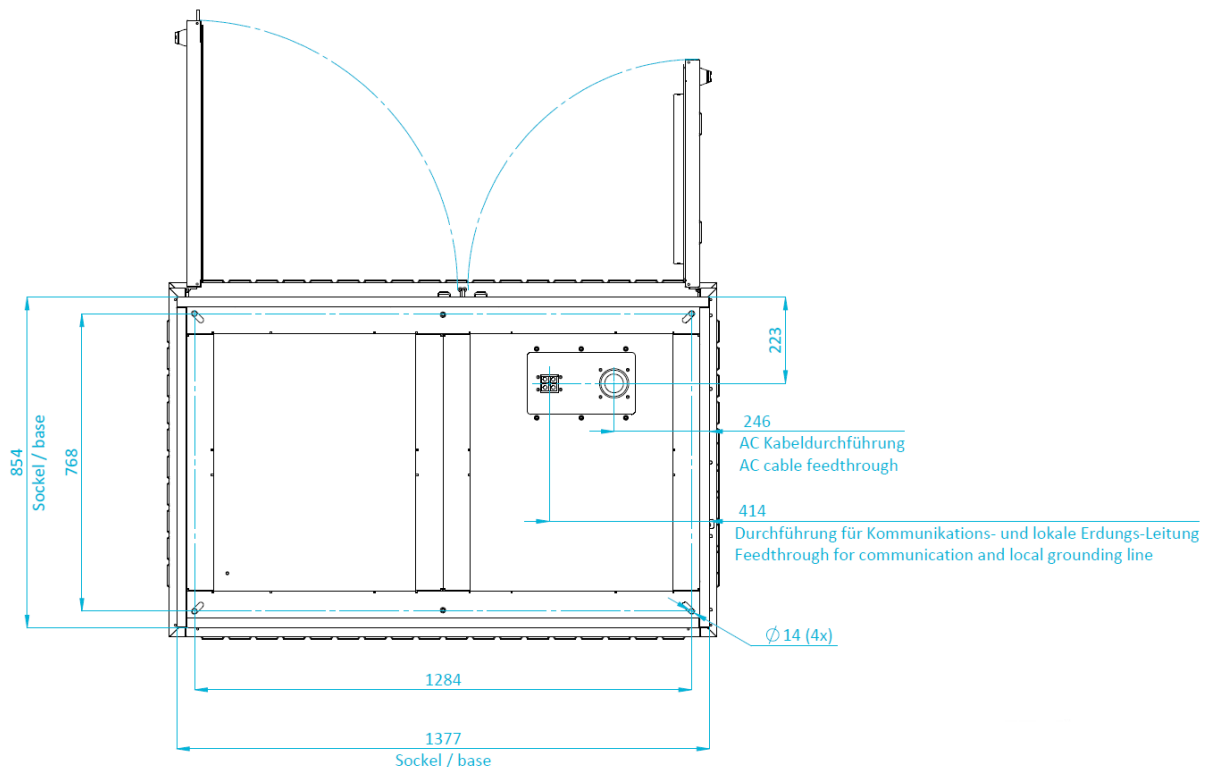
DIMENSIONS FOR SCREW CONNECTION TO FLOOR SPACE (DETAIL FROM CONSTRUCTION DRAWING)
